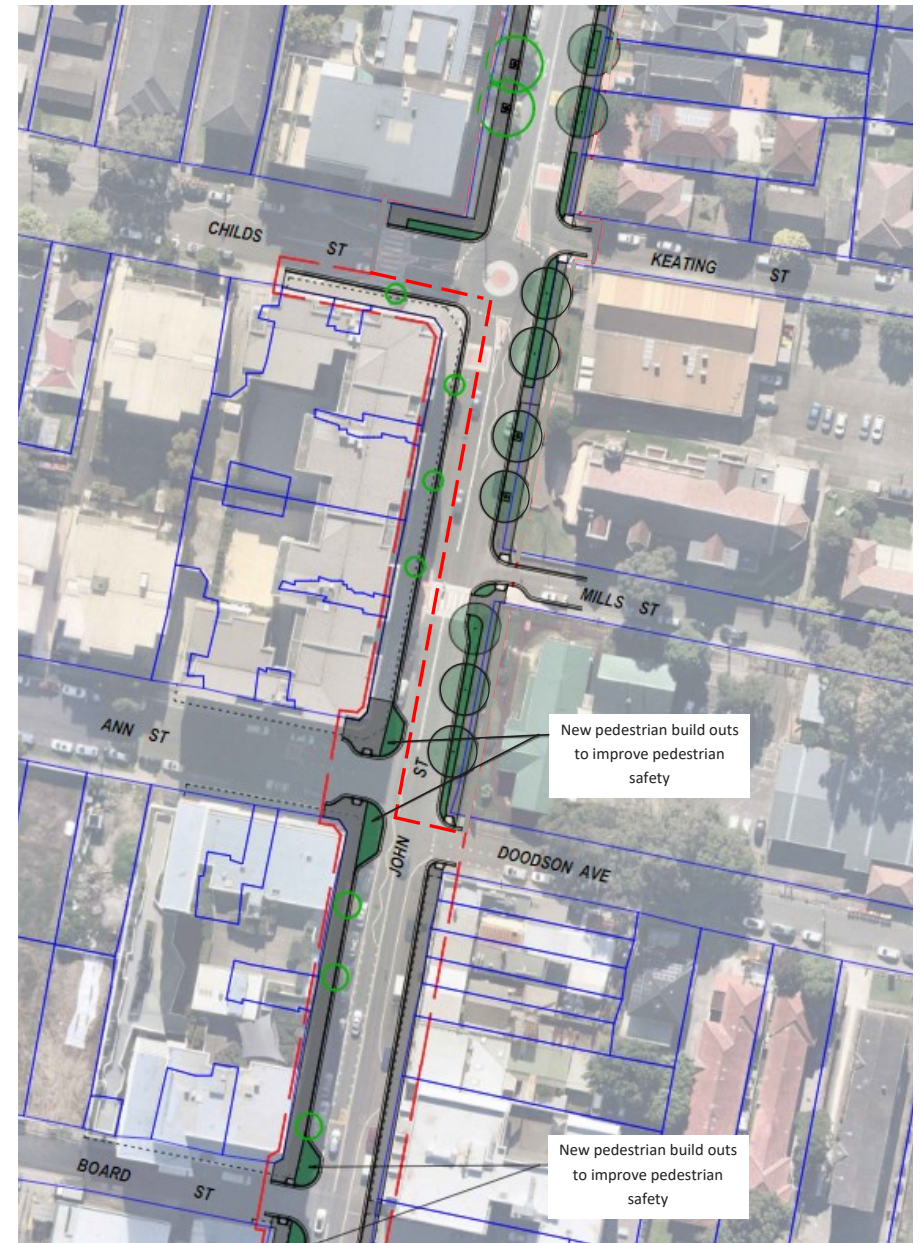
John Street Precinct Concept Plan (Board Street to Childs Street)
